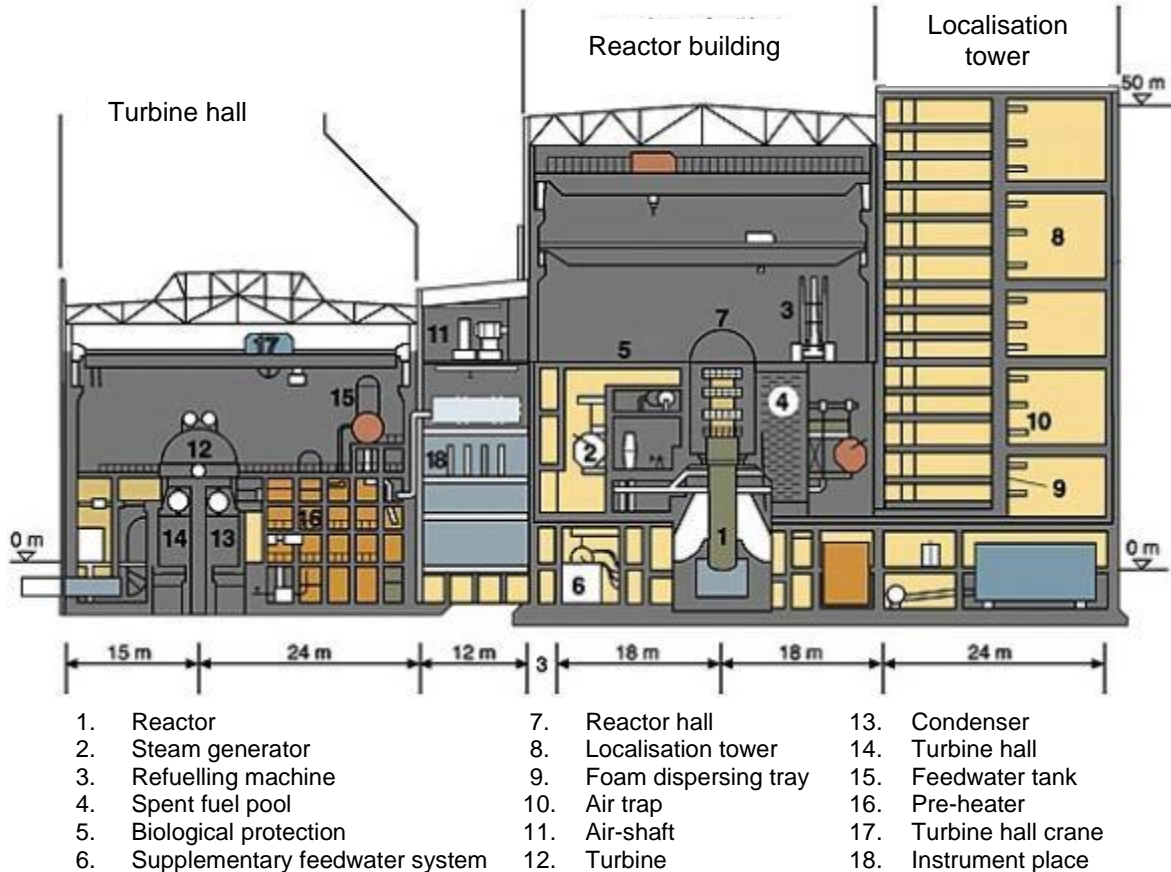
Cross-section of the building complex containing the main equipment of the power plant
